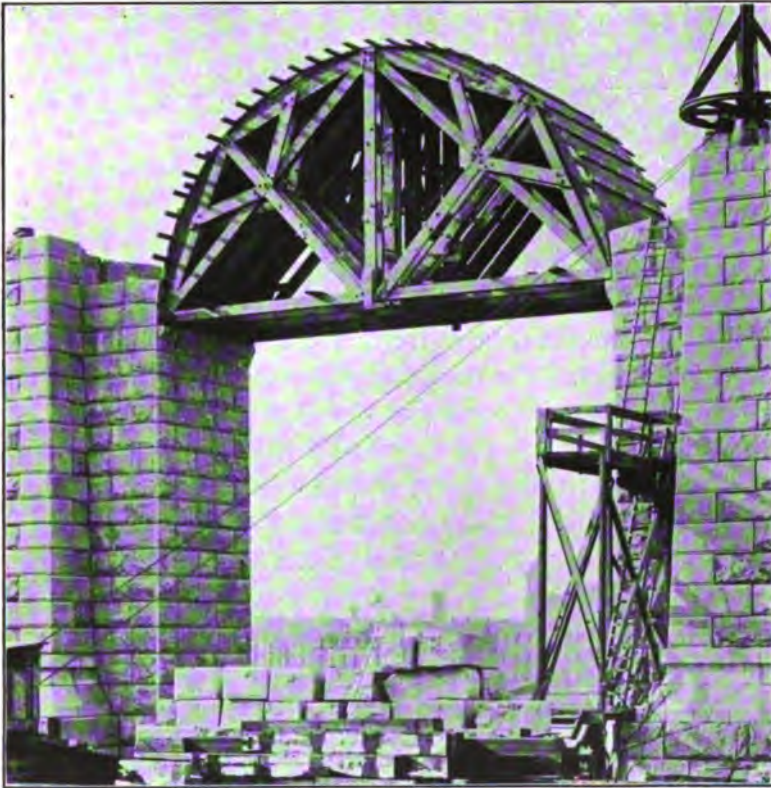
k*. Center for Pier Arch of Queensboro Bridge, New York.
